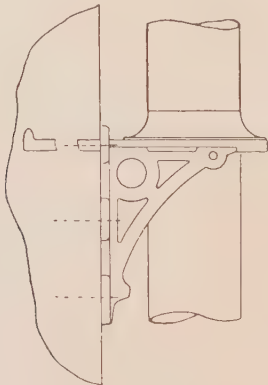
Cast-Iron Bracket supporting Lead Soil Pipe.
